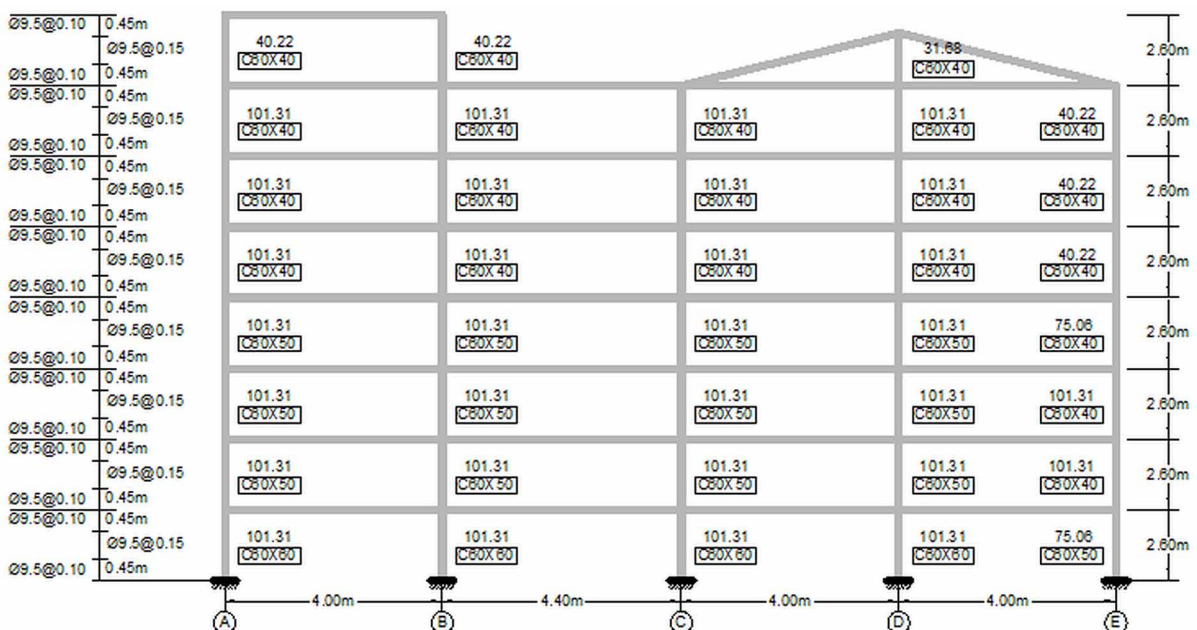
Residential building, geometry and reinforcement in beams of the frame 4
